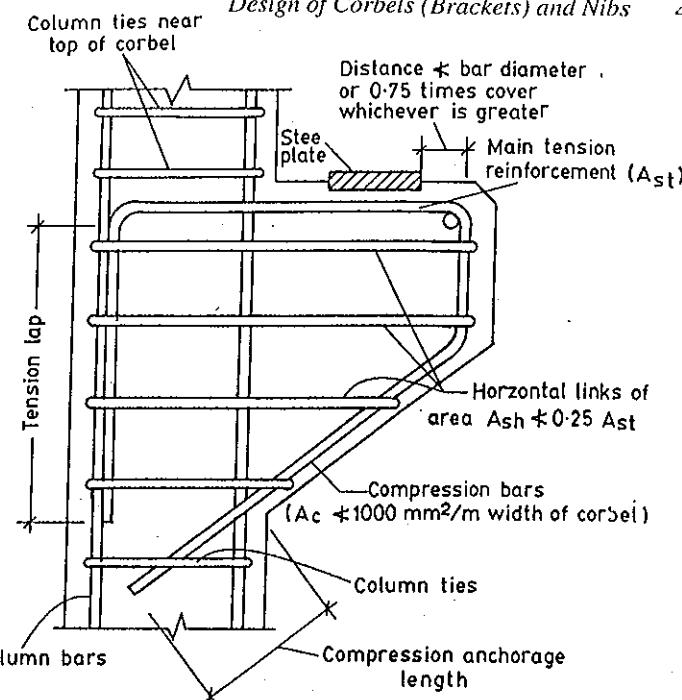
Reinforcement Details in Corbel With Main Reinforcement of 16 mm Diameter and Less (SP:34)
